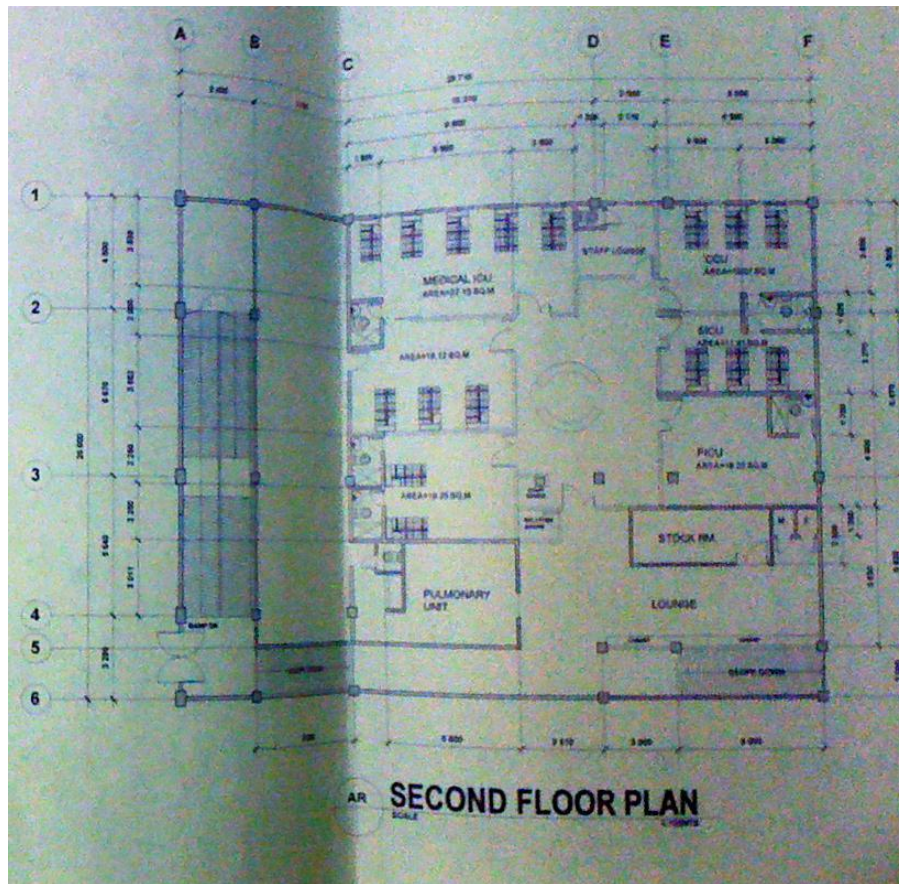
Sample Floor Plan of Hospital C (Rooms)
